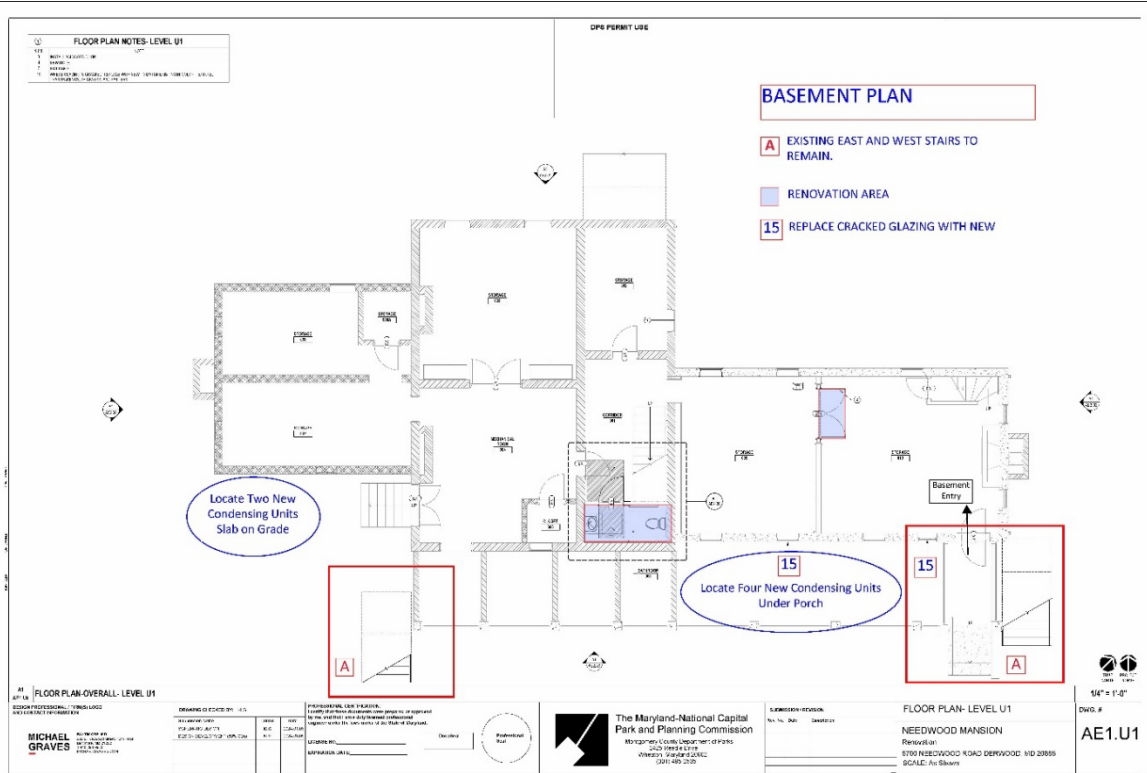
The proposed basement floor plan will include two pads for condensing units.
